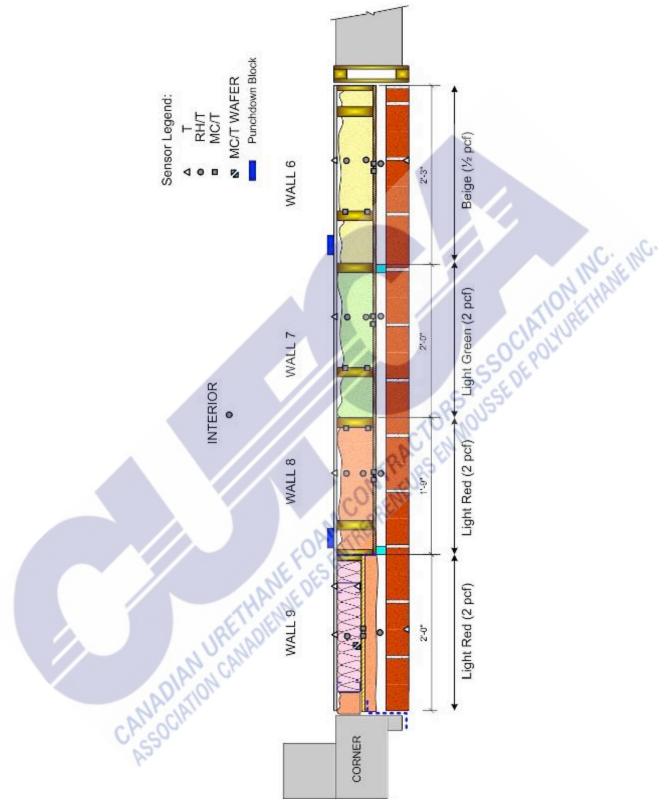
Wall Assemblies Installation in BEGhut (plan view)
